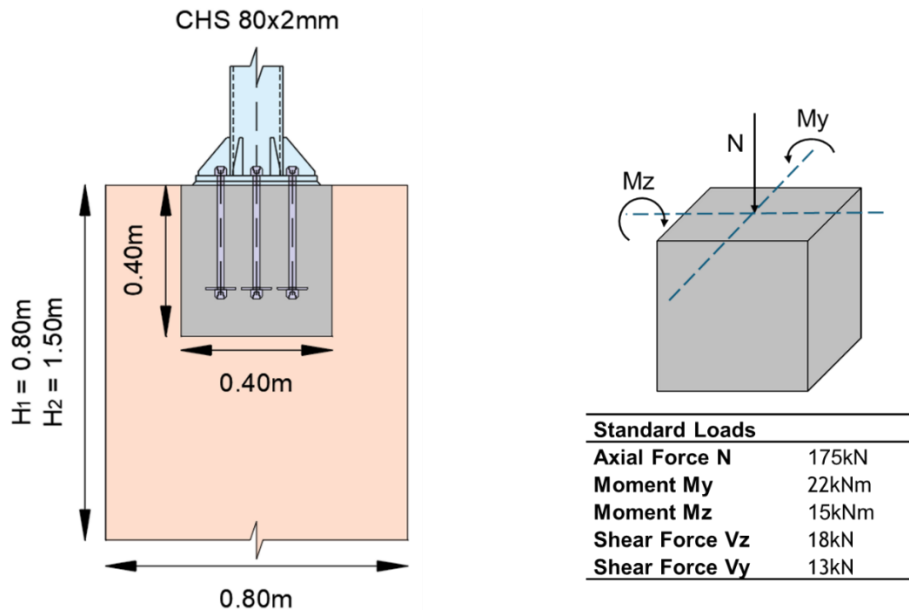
Geotechnical model for the analyses executed for the foundation of the new shelters on the prehistoric masonry wall at the Royal Chambers area and the loads transferred from the columns according to contemporary design standards. Two wall heights (H_1 and H_2) were examined.
